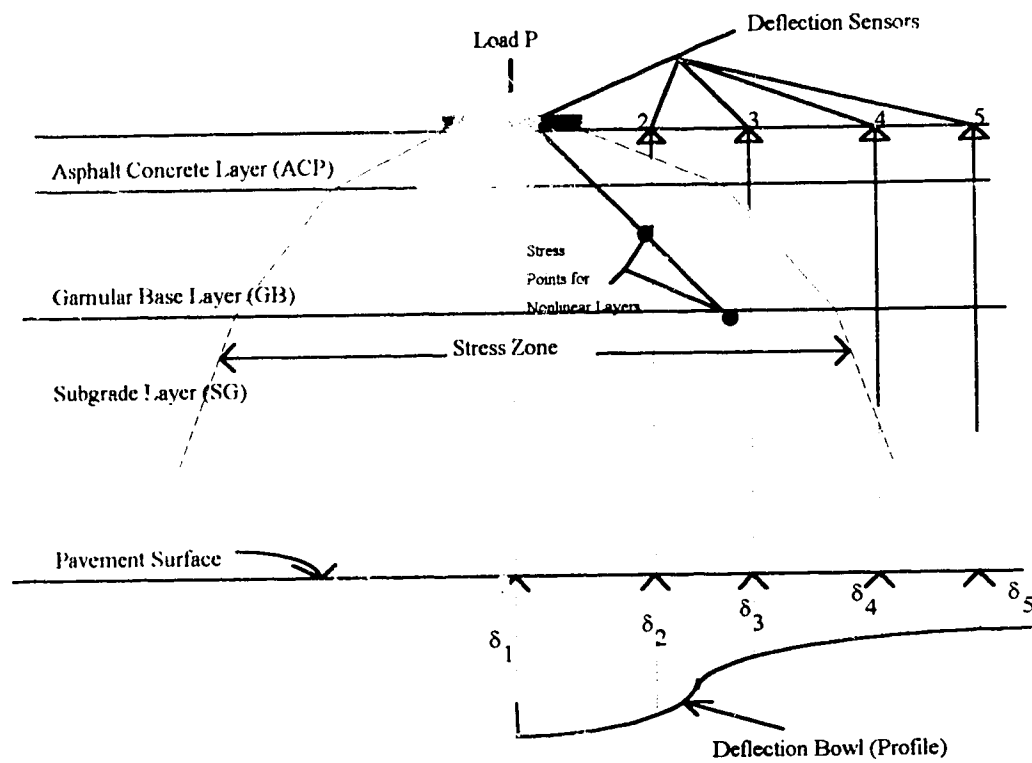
Stress Zone Within A Typical Pavement Structure and Shape of the Deflection Basin
